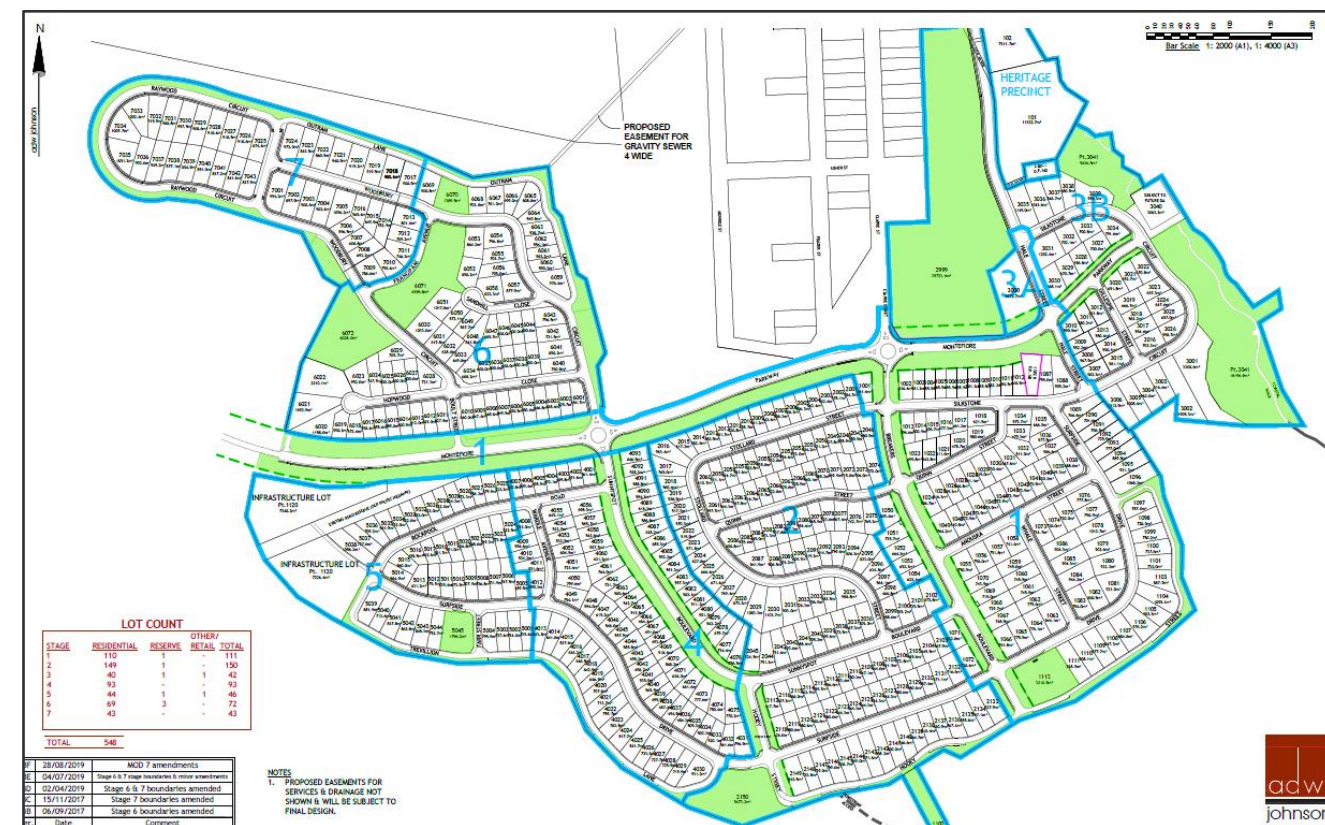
| Proposed subdivision layout and staging plan, with stages shown in blue (Source: Proponent's MOD 7 Report)
